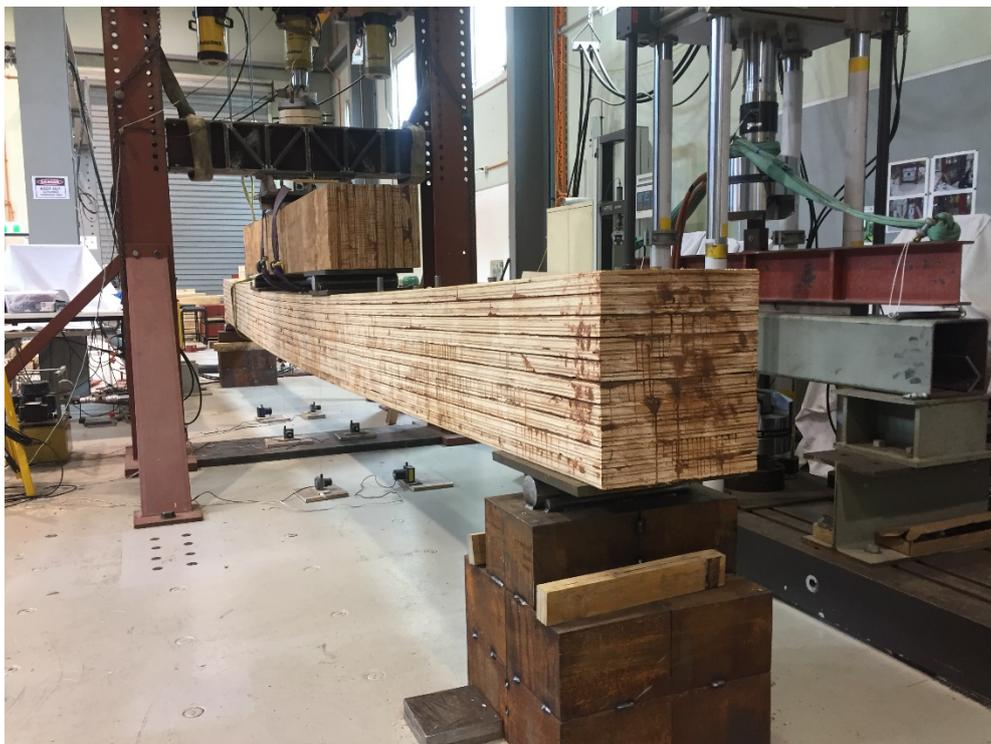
Strength testing of prototype veneer-based bridge girders
